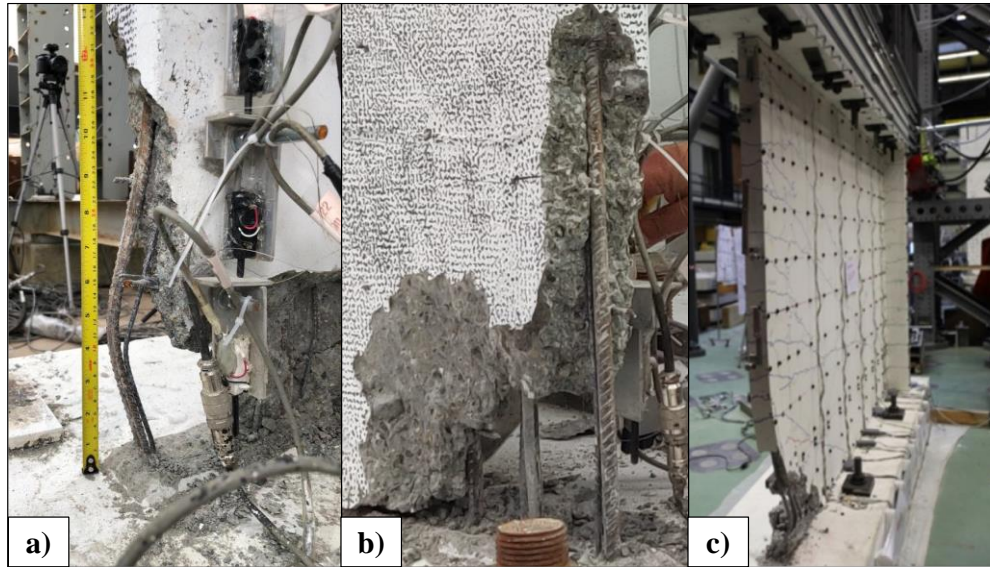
Experimentally-observed damage in thin RC walls: (a) rebar buckling, (b) unconfined concrete spalling, and (c) out-of-plane instability (Blandón et al., 2020; Rosso et al., 2016).
